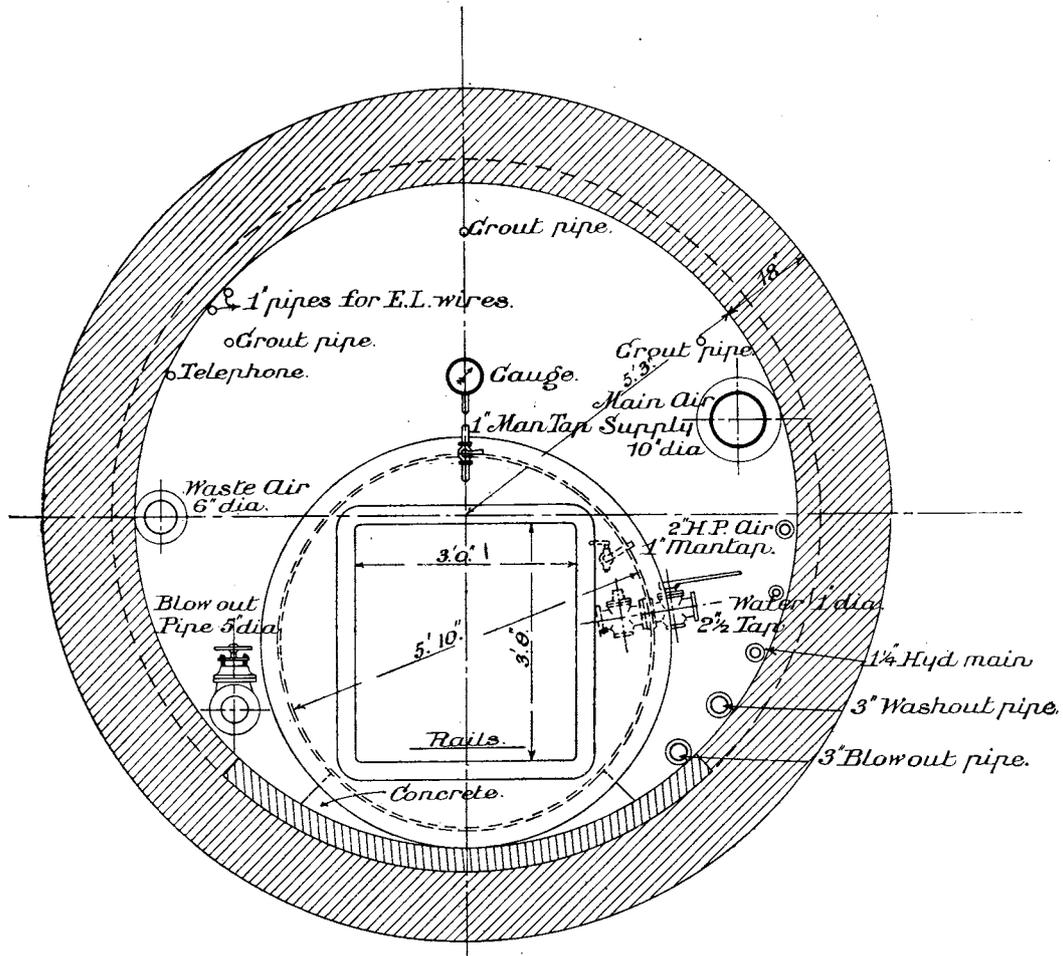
TYPICAL AIRLOCK FOR TUNNEL WORK.
